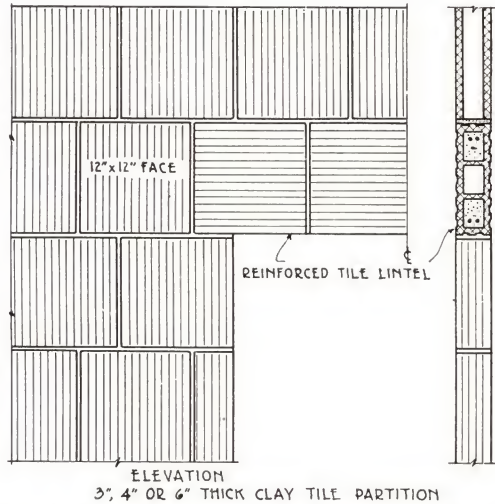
Elevation and section views of a 3- or 4-inch tile partition wall.
